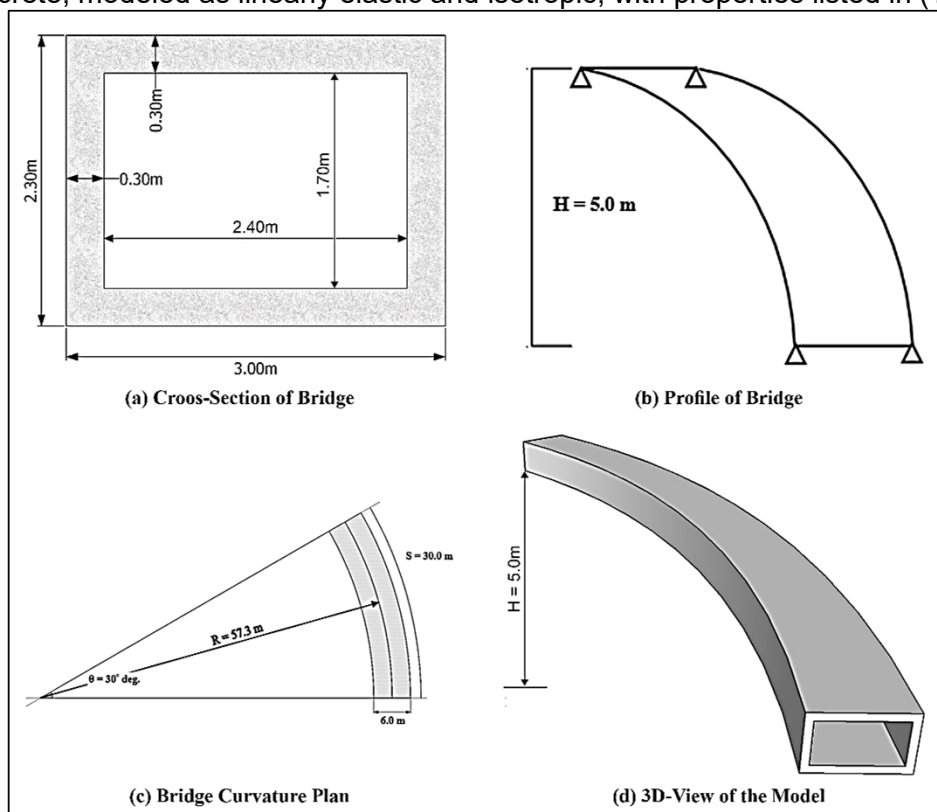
Details of Curved Bridge with Single-Cell Cross-Section
